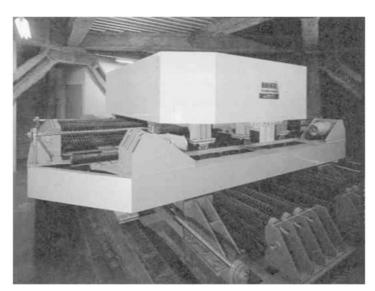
Tuned mass damper with spring and damper assemblage.
